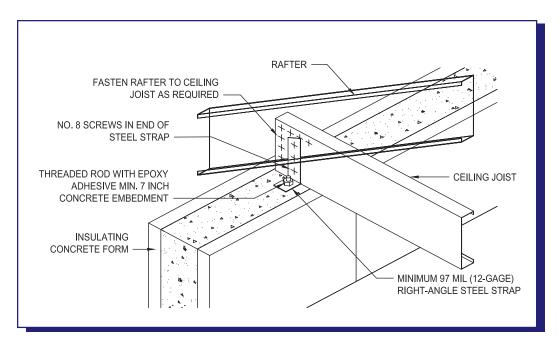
Steel Strap Connection With Epoxy Anchor at Wall Parallel to Ridge
